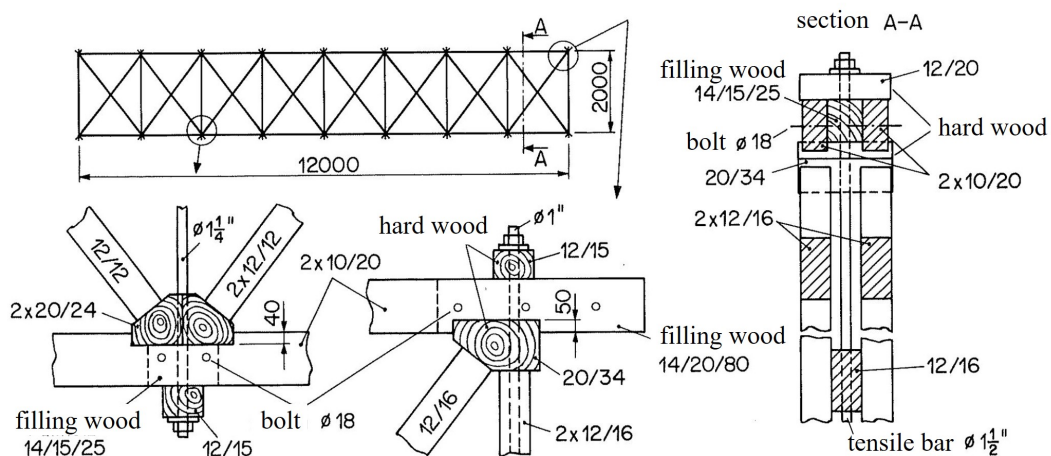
HOWE's truss with vertical prestressed steel bars, translated from [52].
